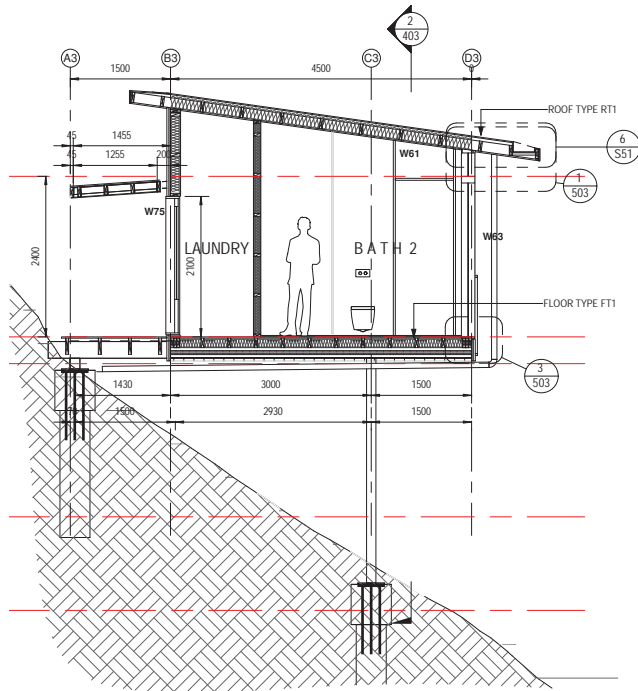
Section showing sub floor steel portal frames sitting on pile caps hidden below ground level. Source: Jarrod Midgley Architect
